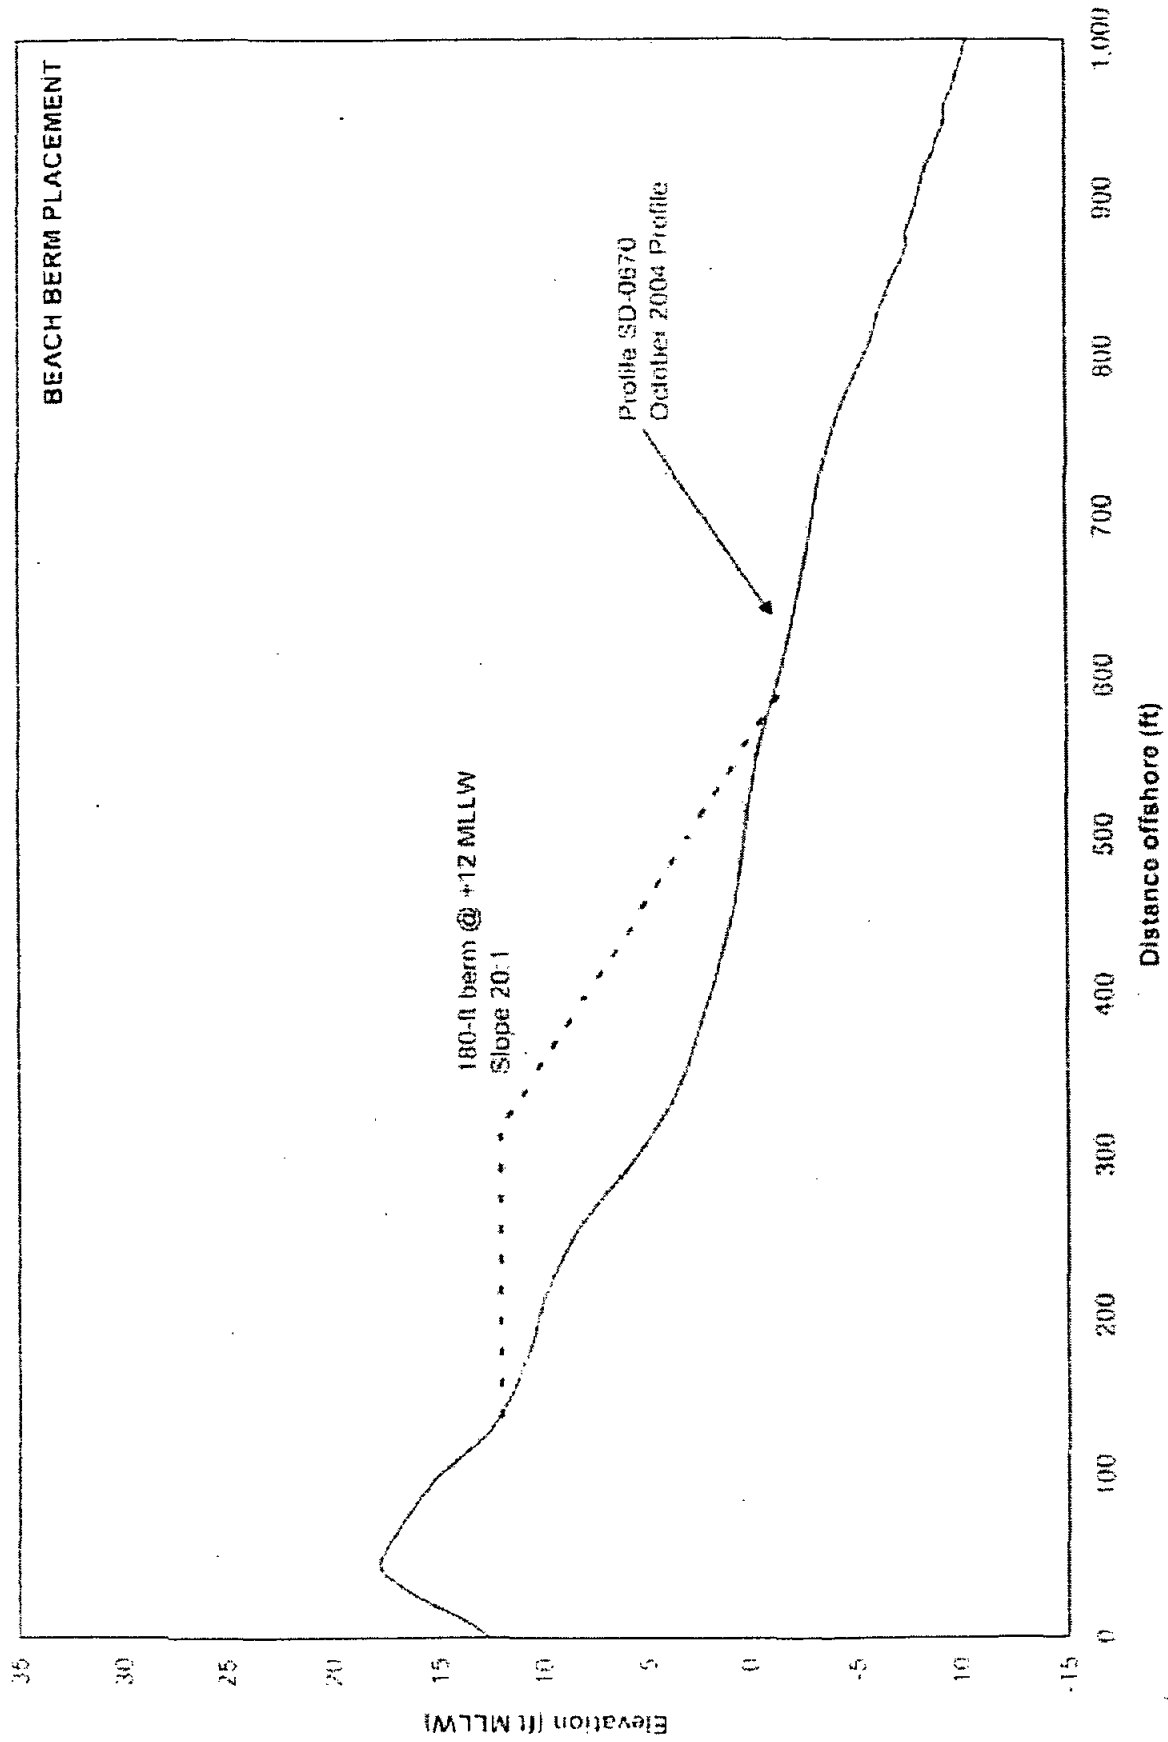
Batiqitos Beach Typical Cross Section – Beach Berm Placement
